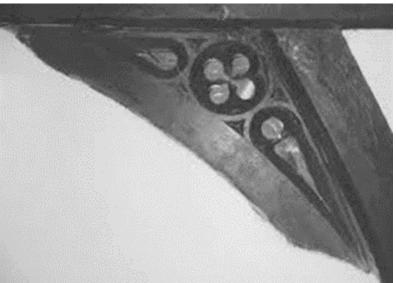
Imberhorne Farm Cottages - carved timber detail to roof structure (archive photo)
